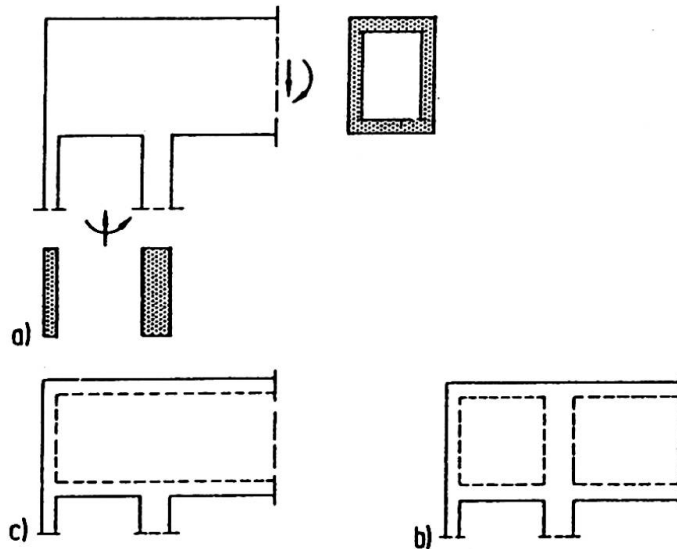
a) View and cross-section of the box girder and support walls. b) Longitudinal section with interior diaphragm wall. c) Longitudinal section without interior diaphragm wall
